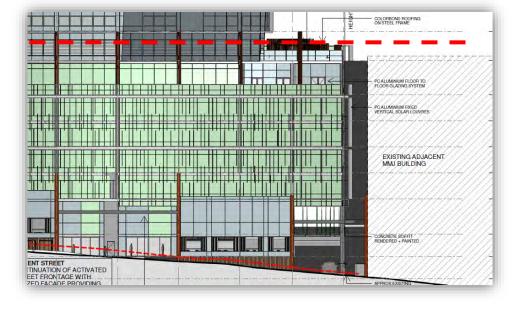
Regent Street Frontage Height Defined by Surrounding Built Form
